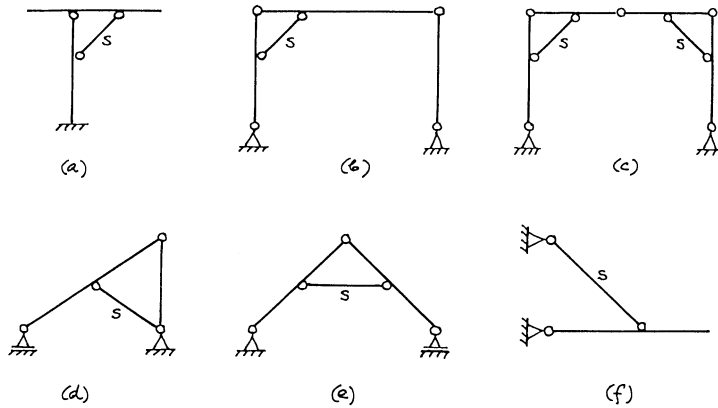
(a) A fixed end and (b) a rigid corner connection, both created by using a shoring bar. (c) If the shoring bar can transfer only compressive forces, two shoring bars are required to prevent the tilting to the left and to the right.
